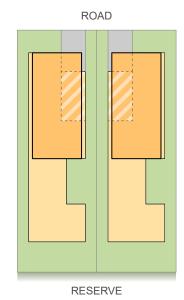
Separation from the private open space of another dwelling on the same site as required by clause 13.8.6.
